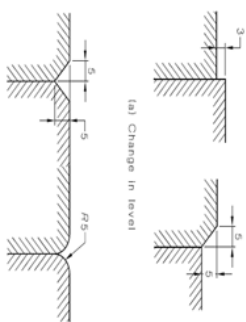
ACCEPTABLE CONSTRUCTION TOLERANCES FOR ABUTMENT OF SURFACES
